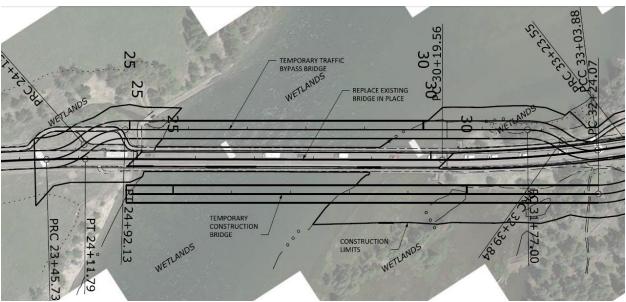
Alternative C (Expanded View, Fishing Bridge, West Side)
